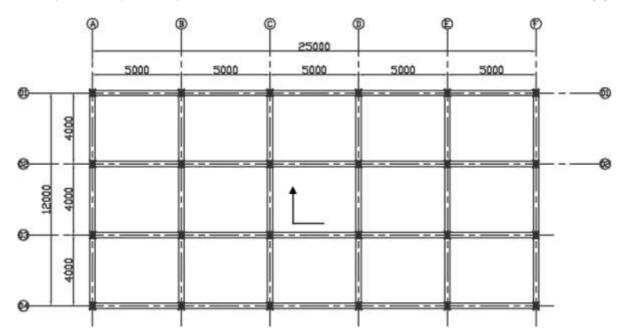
Plan of Two, Six, and Twenty-Story Regular RC Buildings (All Dimensions Are In Mm)
